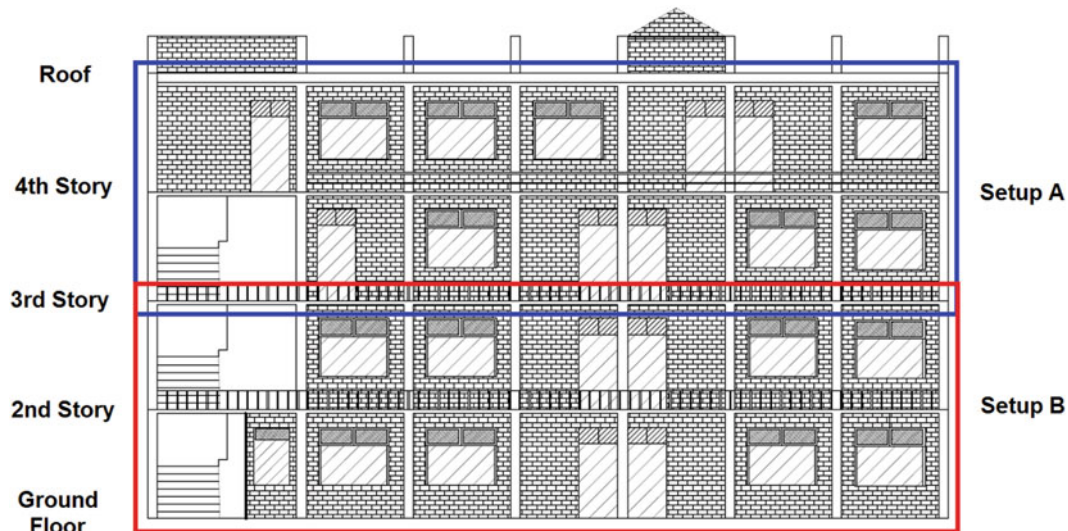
Elevation plan view of the four-story school building at Sankhu
